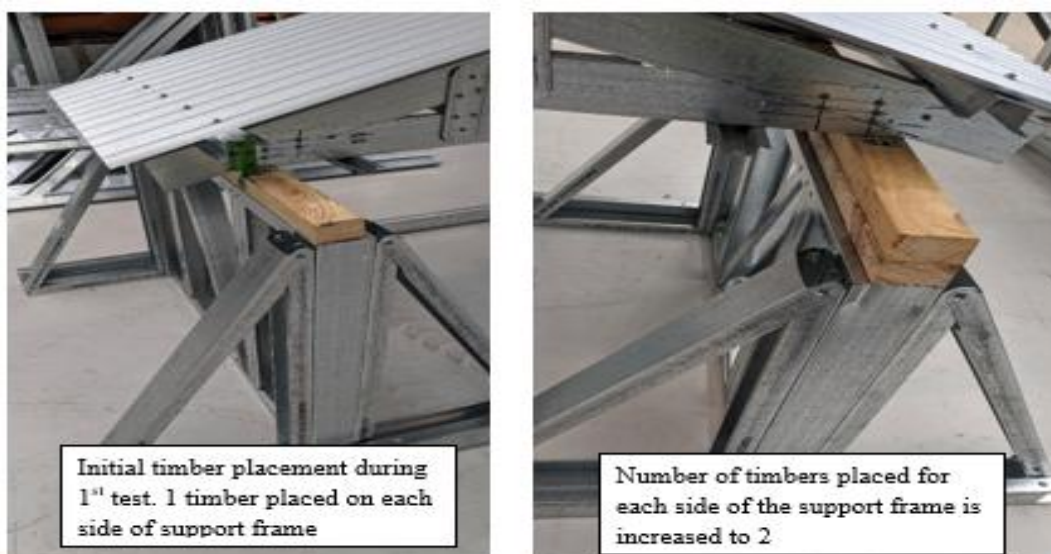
Roof Batten above Top Chords of CFS Truss pair test assembly
